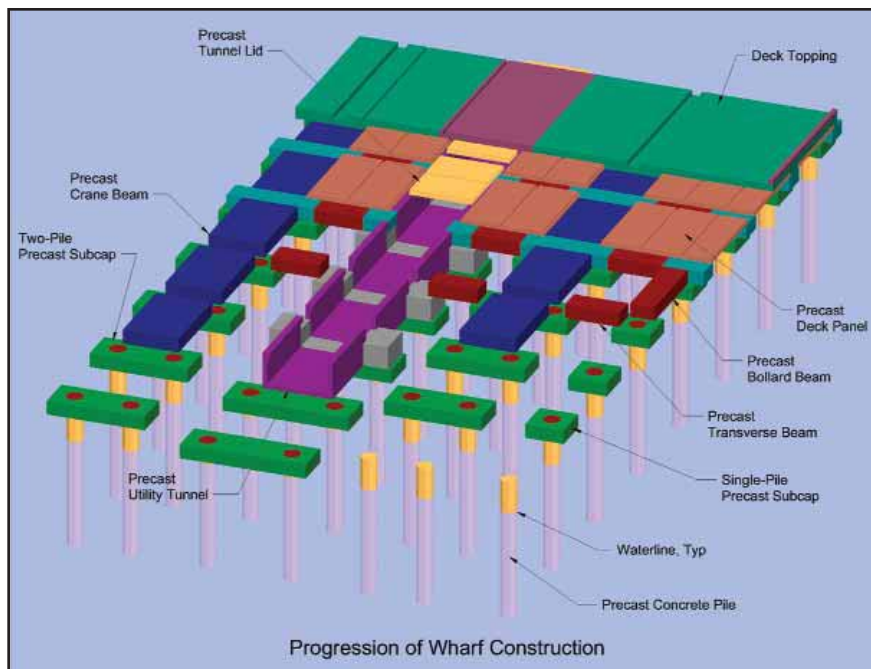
Block diagram of basic components of the pile-founded open wharf system. Precast concrete units provided design flexibility for special utility vaults and complicated structural geometries.
